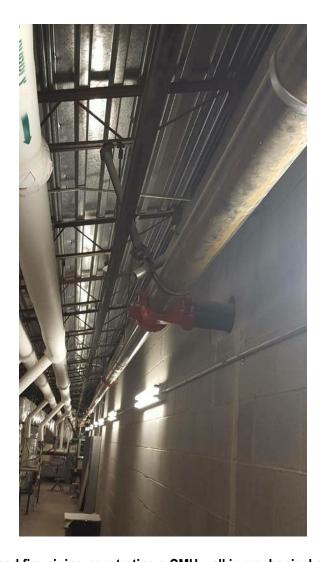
Braced fire piping penetrating a CMU wall in mechanical space at the gym.
